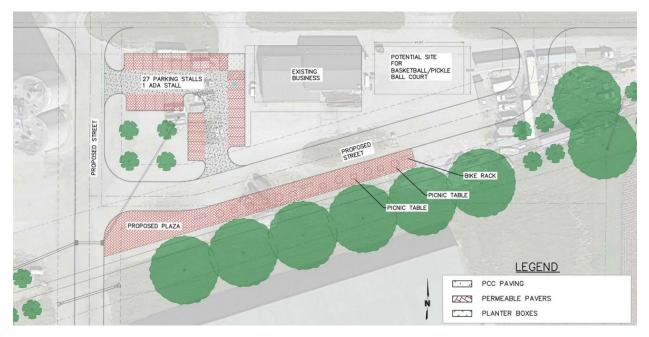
Plaza, Parking, Food Truck, and Potential Sport Court (West Site)
